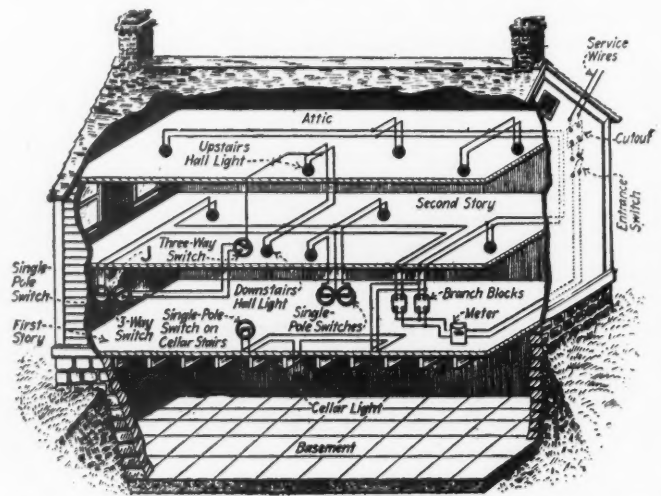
A wiring layout for a typical two-story-and-attic cottage, showing the use of three-way switches for controlling hall and stair lights.
